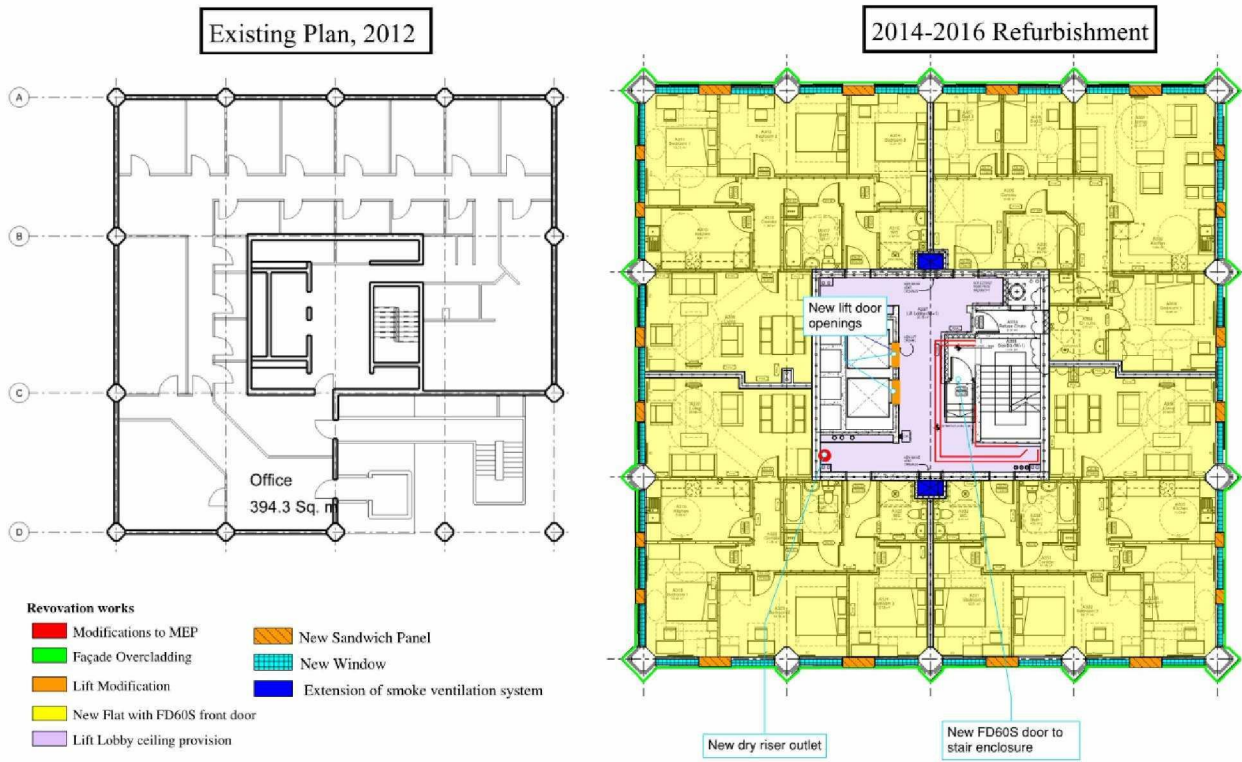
Level 3 – refurbishment plan and existing plan (MAX00000879, SEA00003229)
